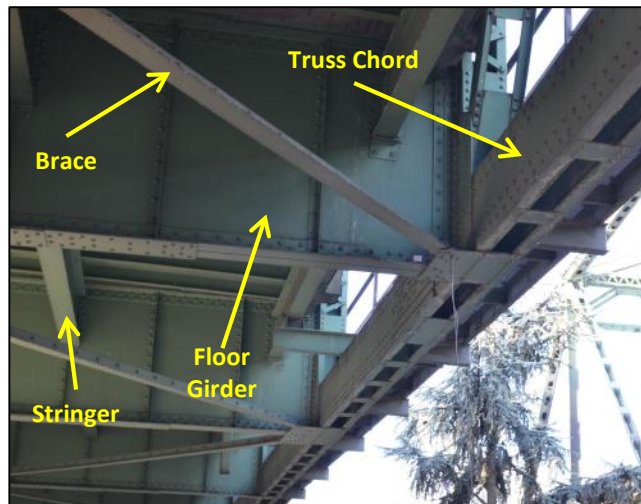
Floor and bracing system of northbound I-5 Columbia River Bridge from below (Lindenberg, 2011).
